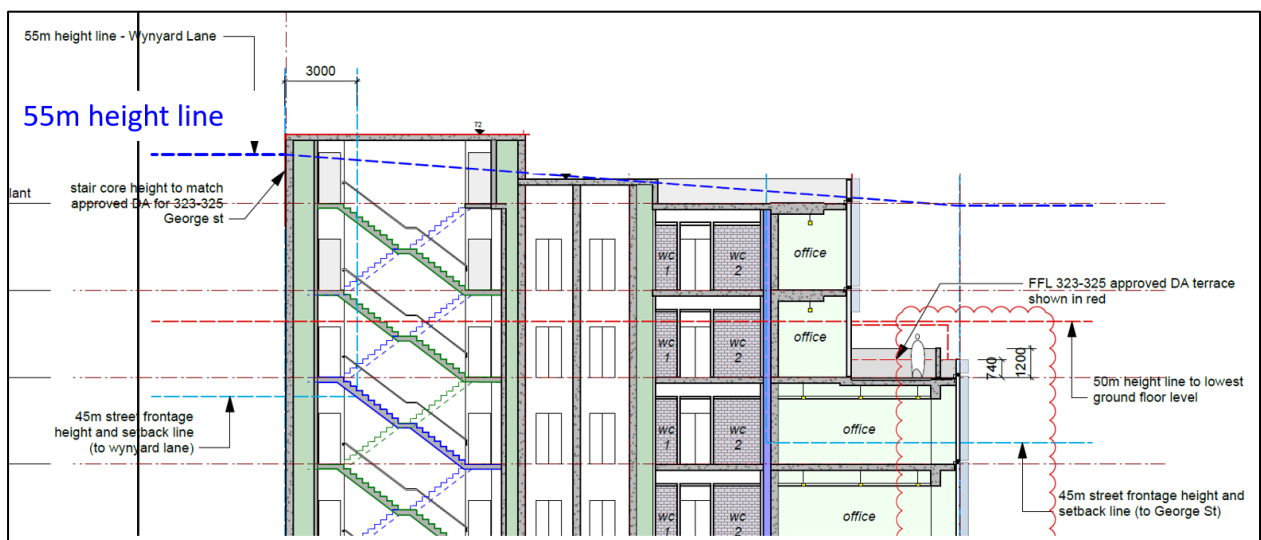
Long section (west - east) of upper levels showing portions of the building above 55 metres (dashed blue line)
